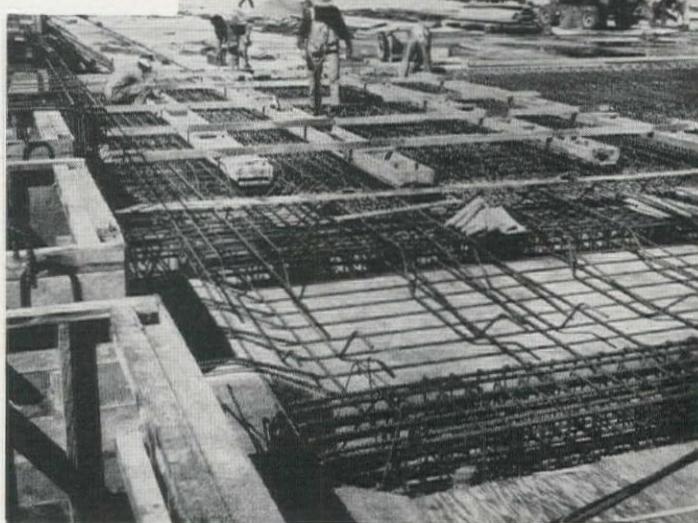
DETAILS OF PILE, JACKET, DECK CONSTRUCTION
